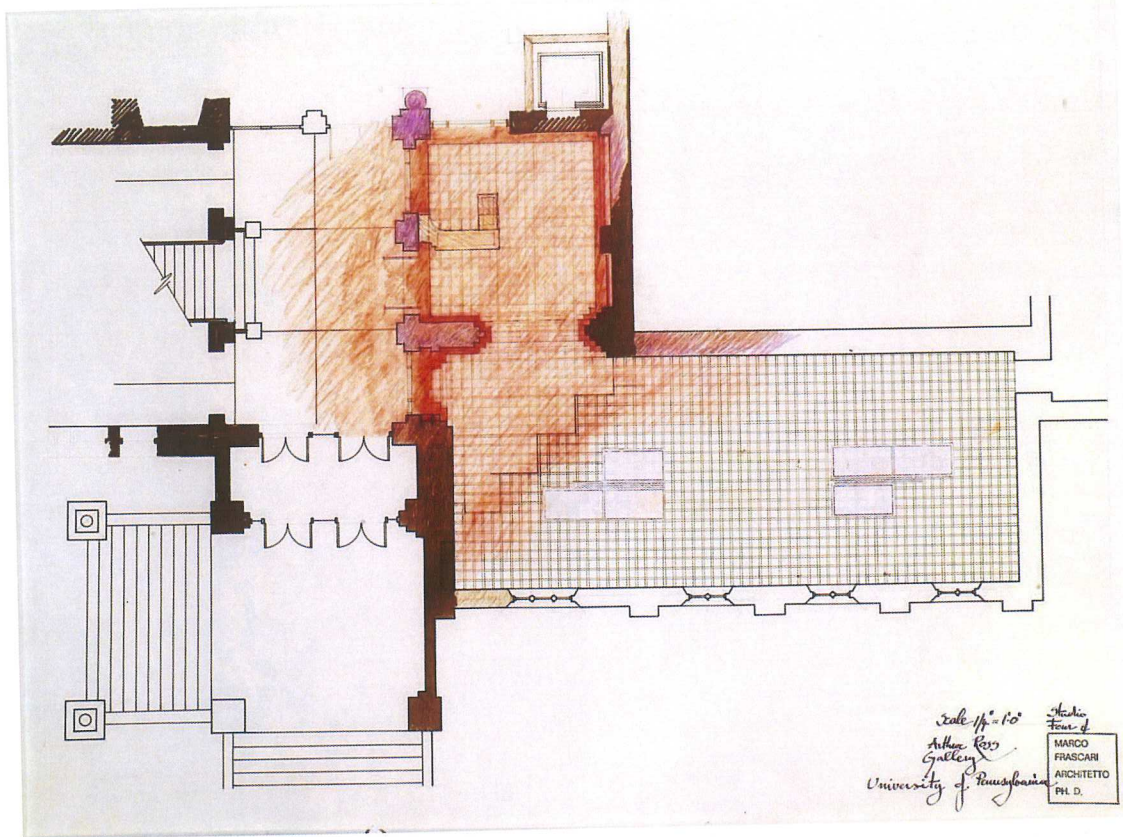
Arthur Ross Gallery, Remodelled Entrance, Plan, (1982)
